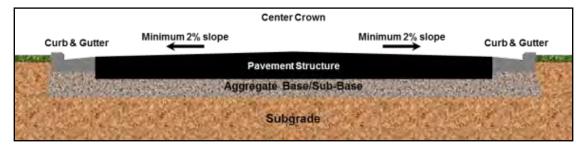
Cross-Section of a Two-Lane Road with Curb and Gutter for Draining of Road Runoff<sup>9</sup>
